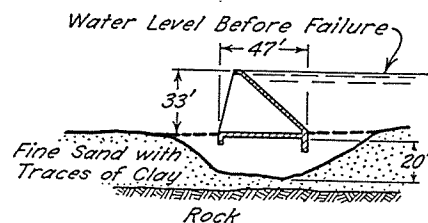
Diagram illustrating failure of dam foundation due to piping.
